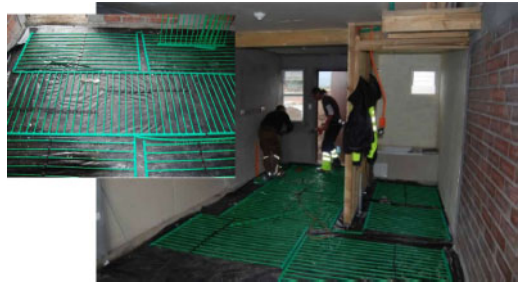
Mat radiation system installed below the floor and ceiling (www.ewktec.com).
